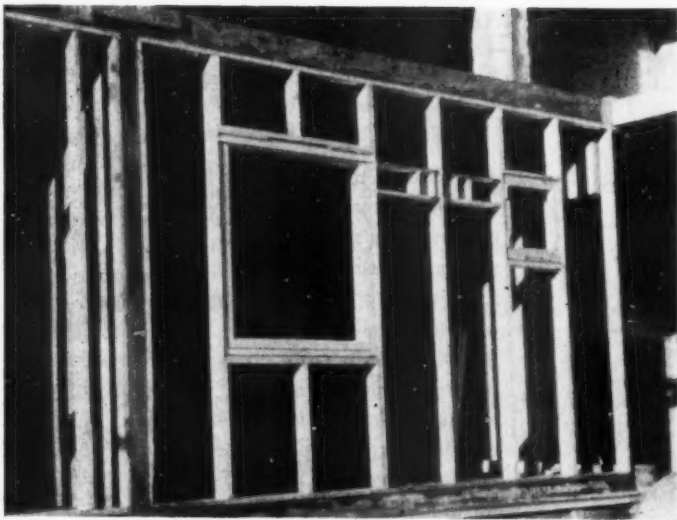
Flats at Bergen. Storey height timber frames before cladding with asbestos cement tiles.
